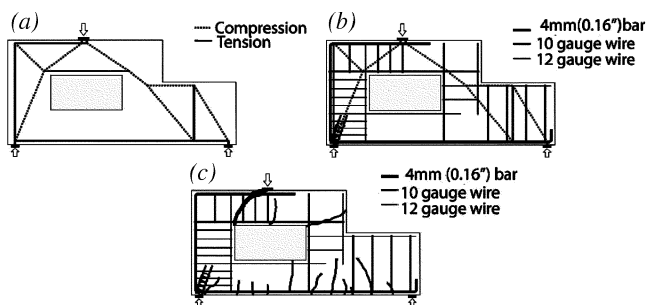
Specimen 4: (a) STM; (b) reinforcing layout superimposed on STM; and (c) crack pattern at failure superimposed on reinforcing layout.
